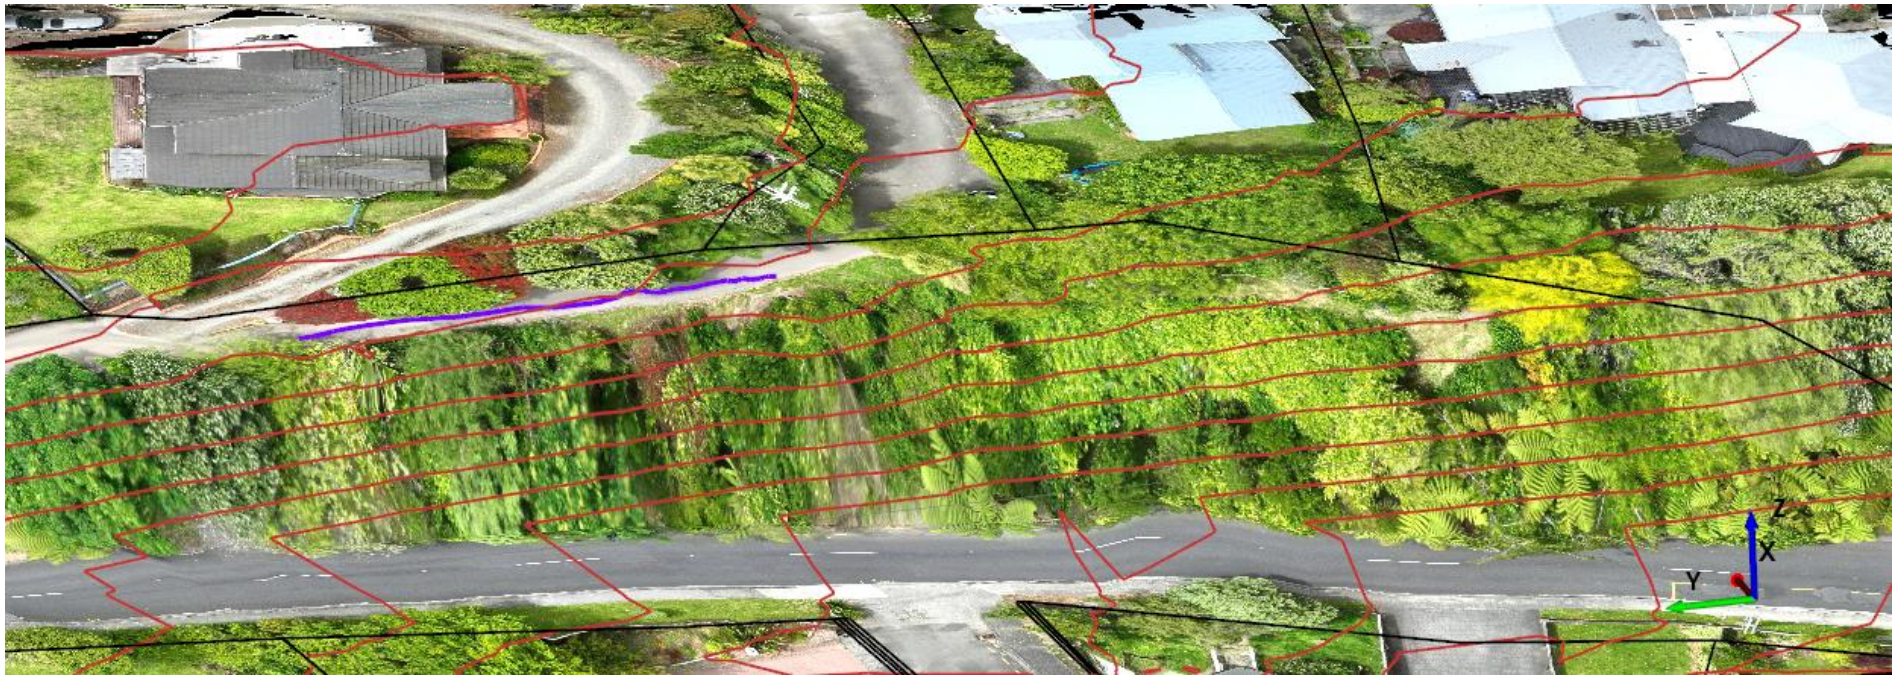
Perspective view of slope between 36 and 18 Park Road. Tension crack shown in purple on upper carriageway. Contour interval 1m.
